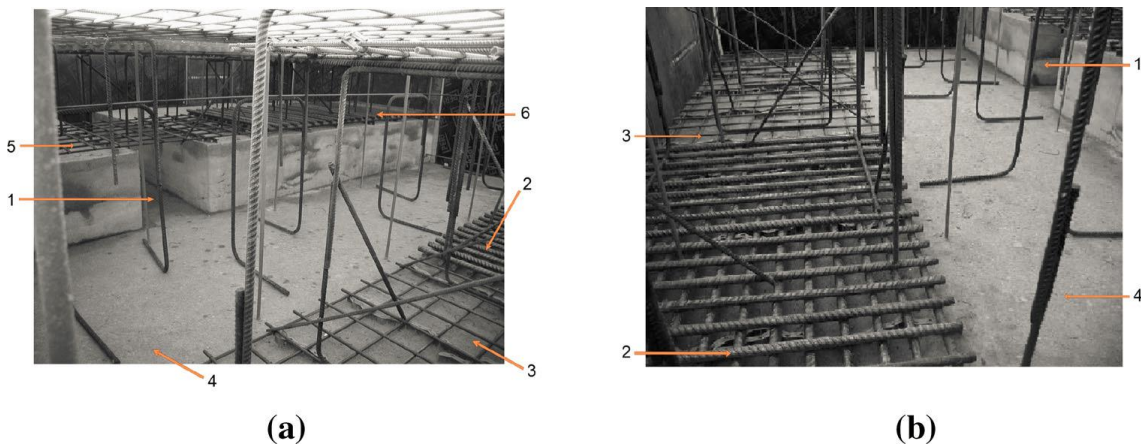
(a) and (b): Views on the lean concrete layer and different levels of reinforcement before concreting (1: Strip foundation, 2: Reinforcement mesh B4, 3: Reinforcement mesh B1, 4: Lean concrete layer, 5: Reinforcement mesh A1, 6: Reinforcement mesh A4). From Krause et al. (2008).
